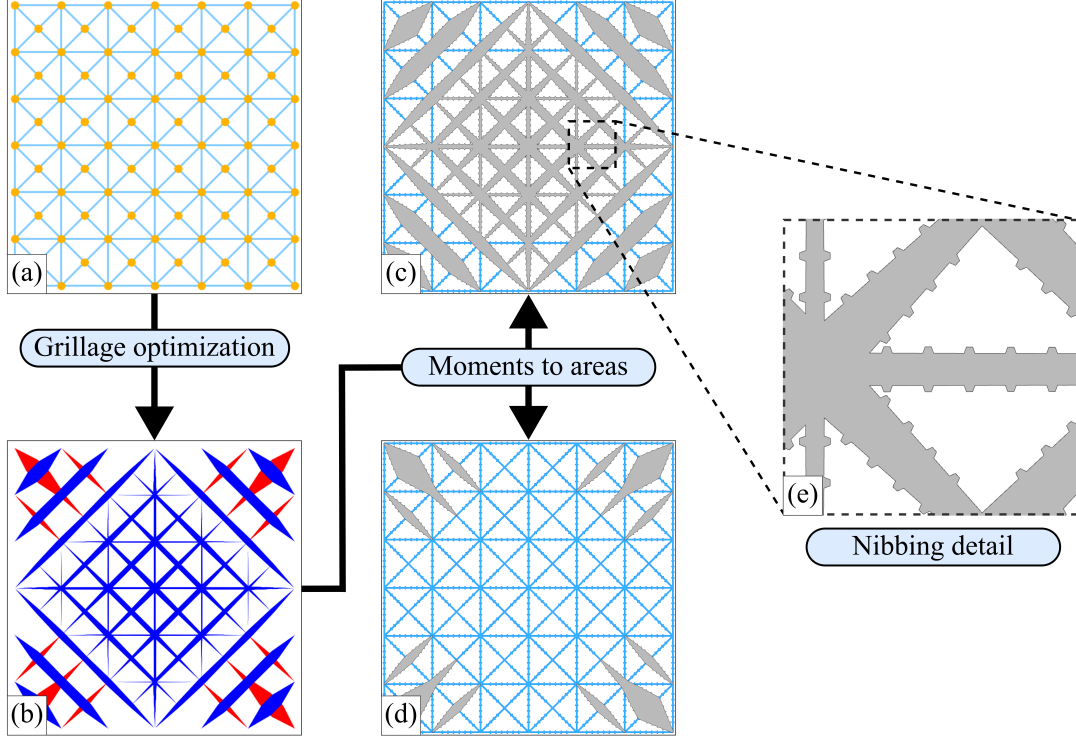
Key steps in the proposed design methodology, considering a uniformly loaded simply supported square slab: (a) adjacent connectivity ground structure, comprising nodes (orange dots) and beams (light blue lines); (b) resulting beam layout with line thickness corresponding to the bending moment magnitudes (sagging and hogging moments shown in blue and red respectively); (c and d) sagging and hogging reinforcement layouts with extra material added for minimum detailing shown in light blue; (e) close up of nibbing detail for increased bond strength.
